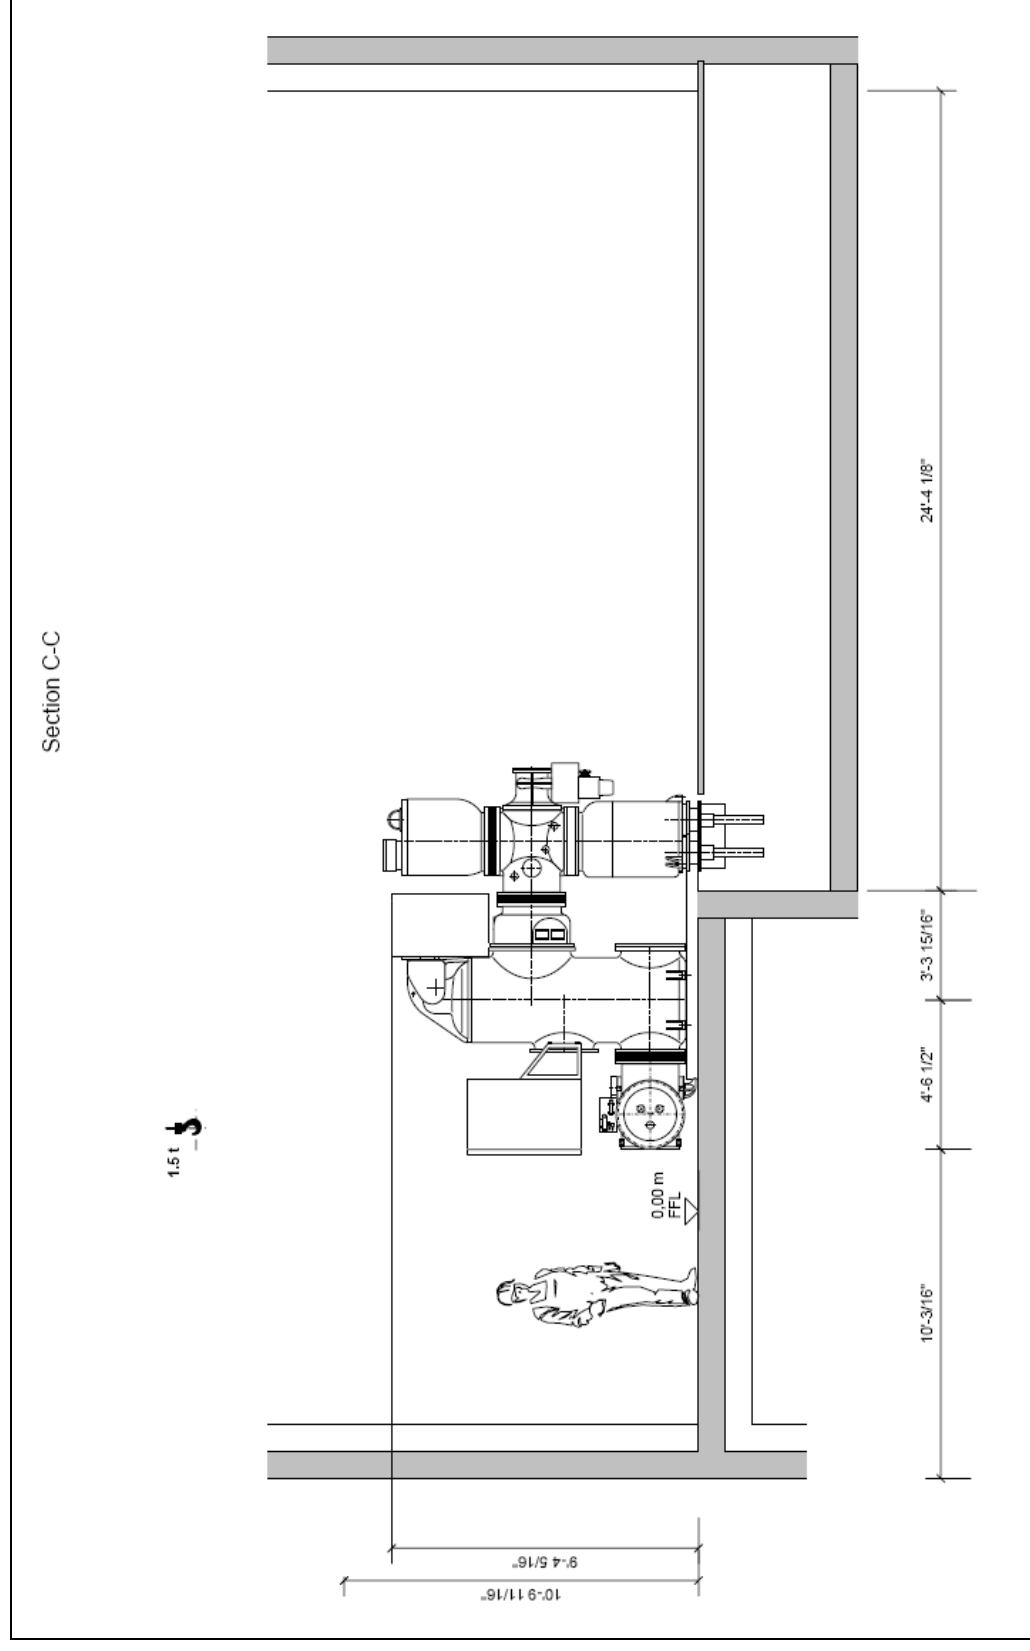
(1 of 3) Santa Rosa Substation Site – Conceptual Elevation Drawings
